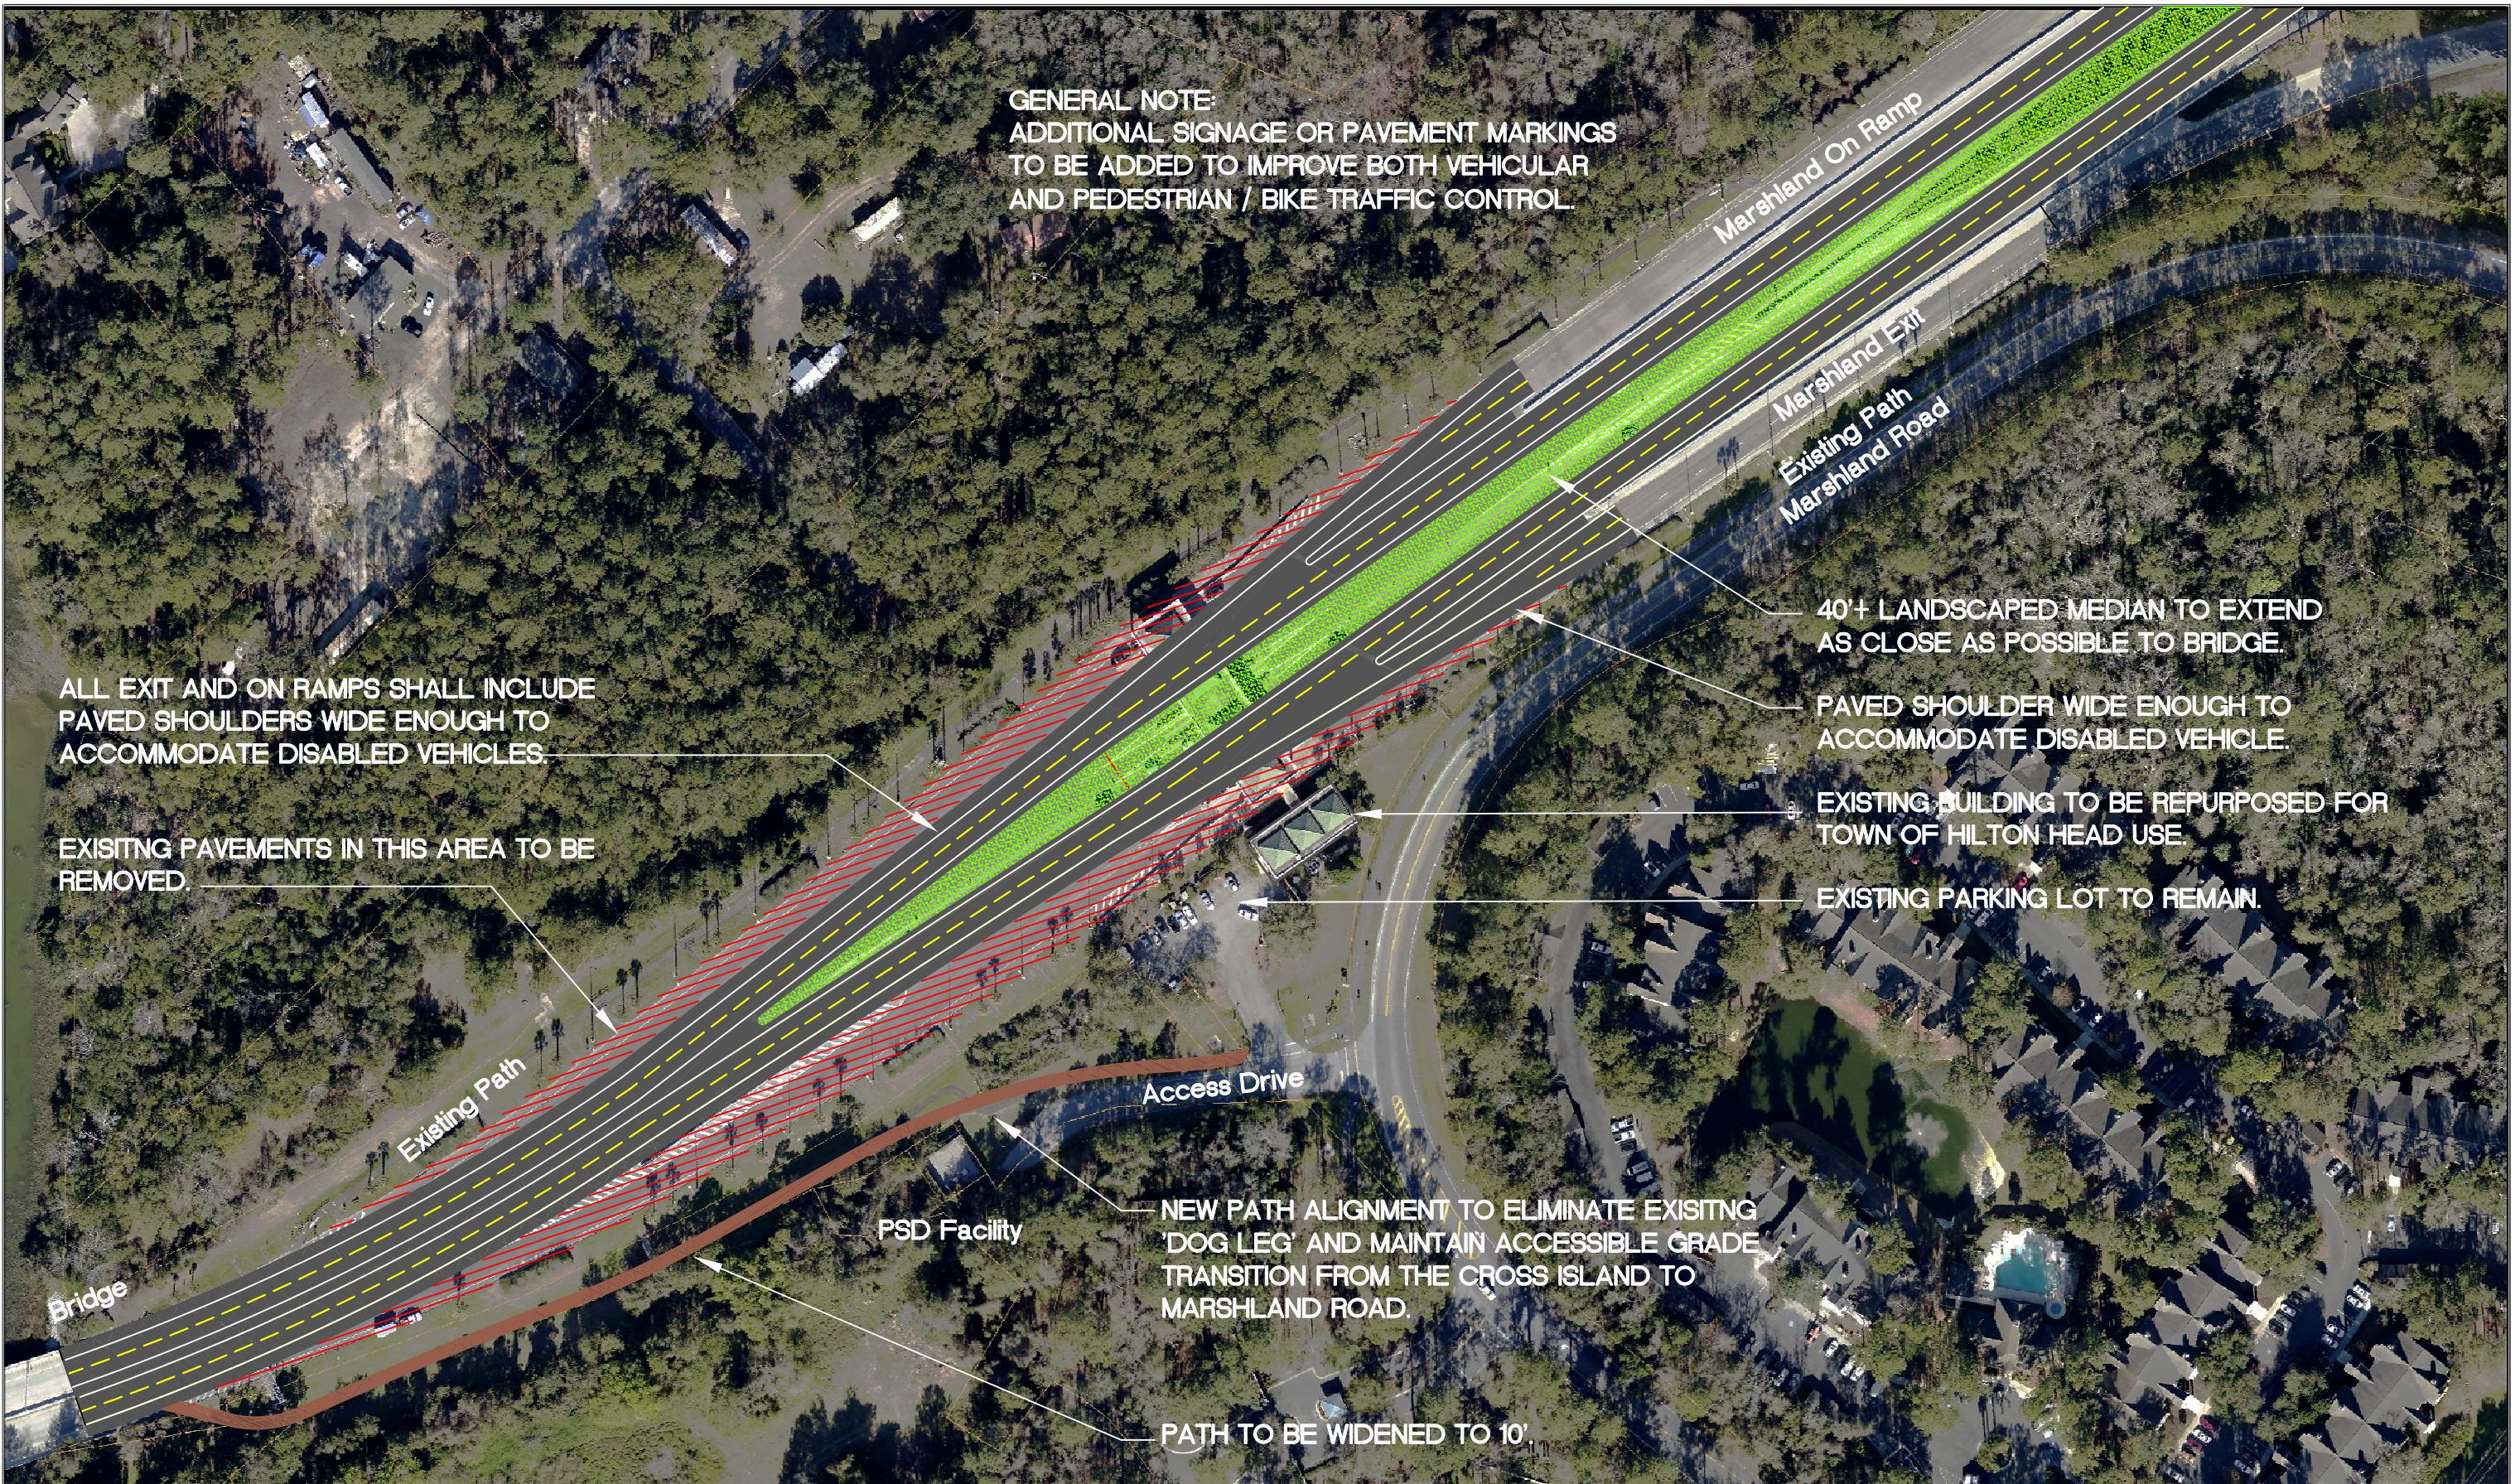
EXHIBIT A - CROSS ISLAND TOLL PLAZA REPLACEMENT CONCEPT
